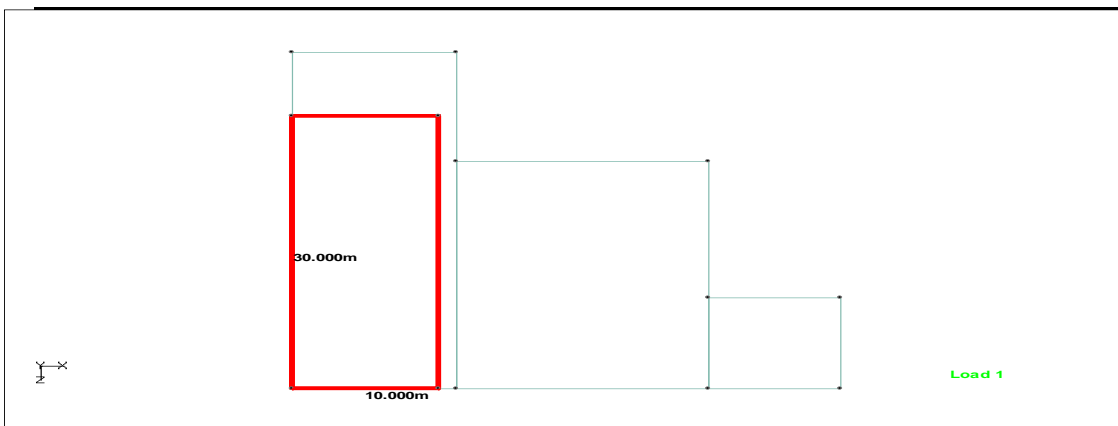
Layout plan of Model Frame 1 (SWIMMING POOL –ONE SIDED)
